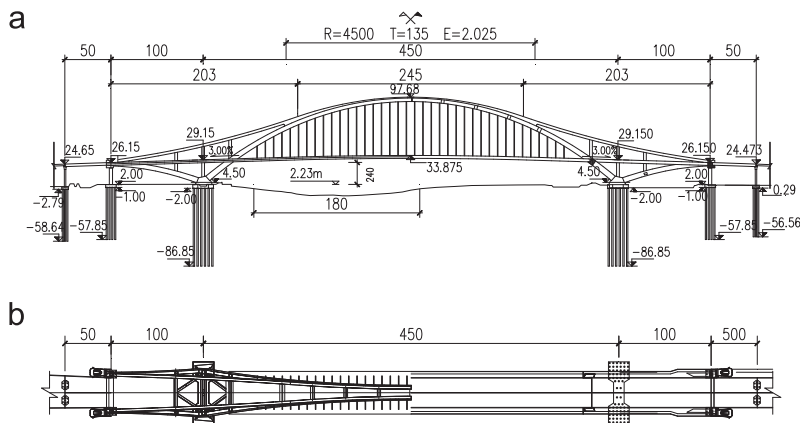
Bridge elevation and plane (unit:m). (a) Elevation and (b) Plane.
